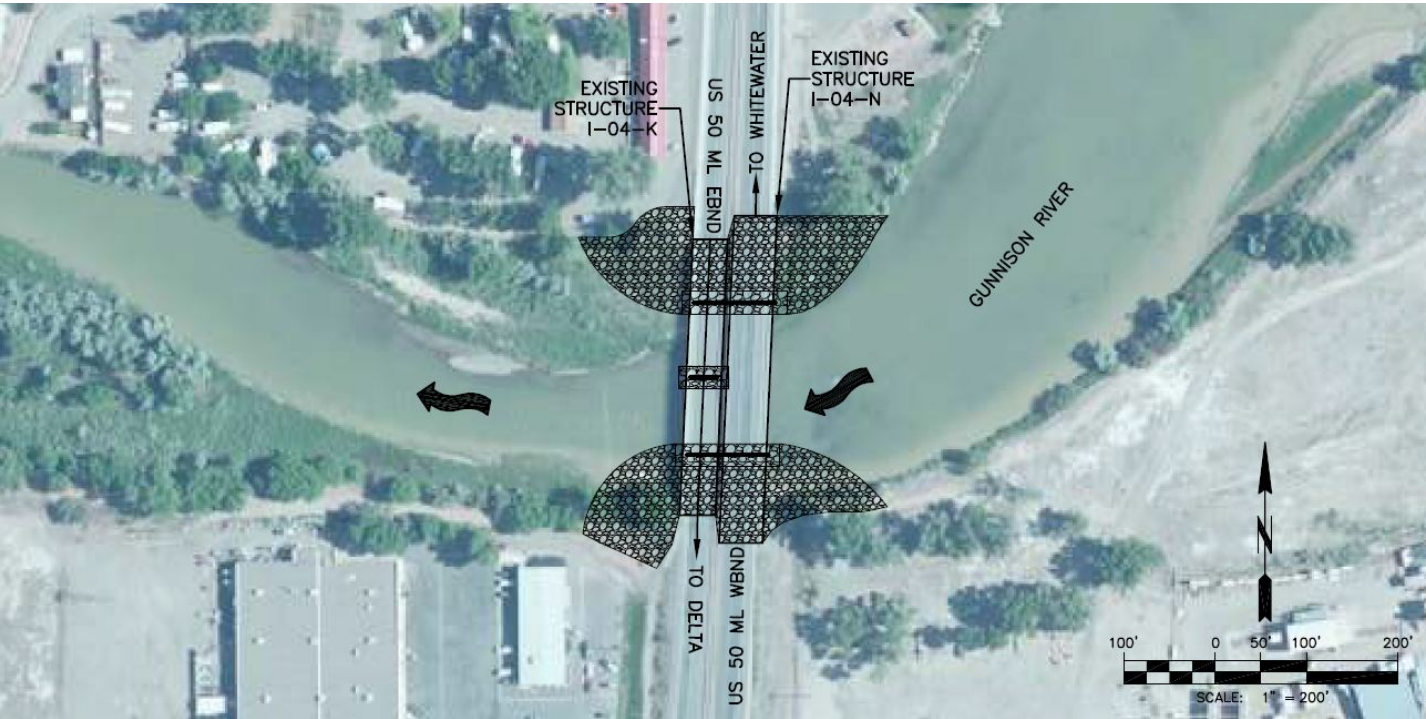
Plan view of Bridge I-04-K with recommended hydraulic scour countermeasure locations
